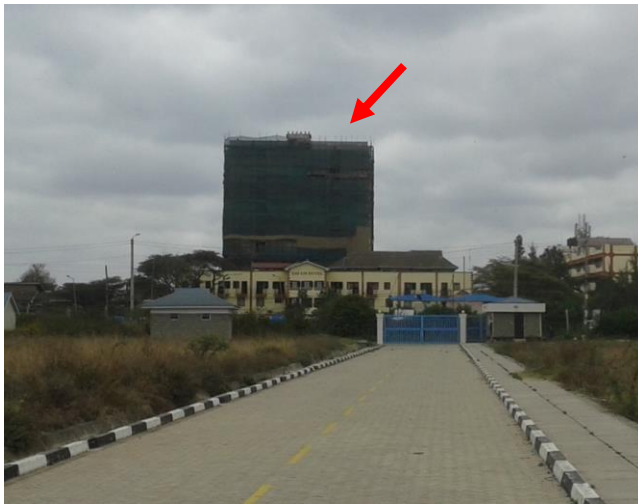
Construction of Commercial Building Behind Dafam Hotel
